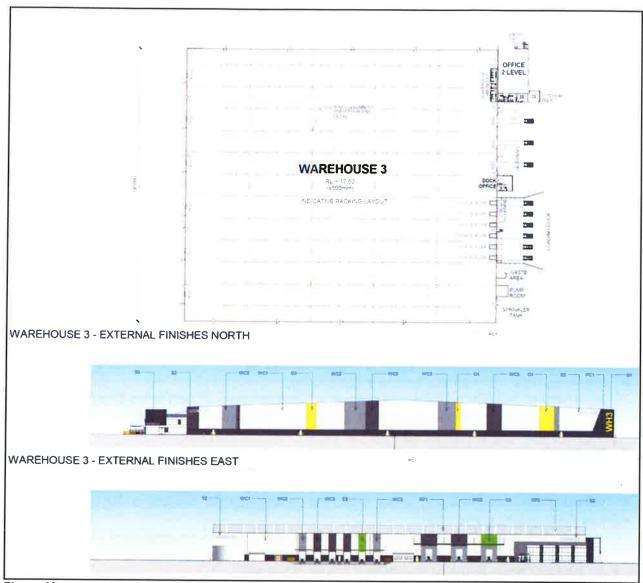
Typical proposed warehouse layout / design (Base source: Applicant's RtS)
